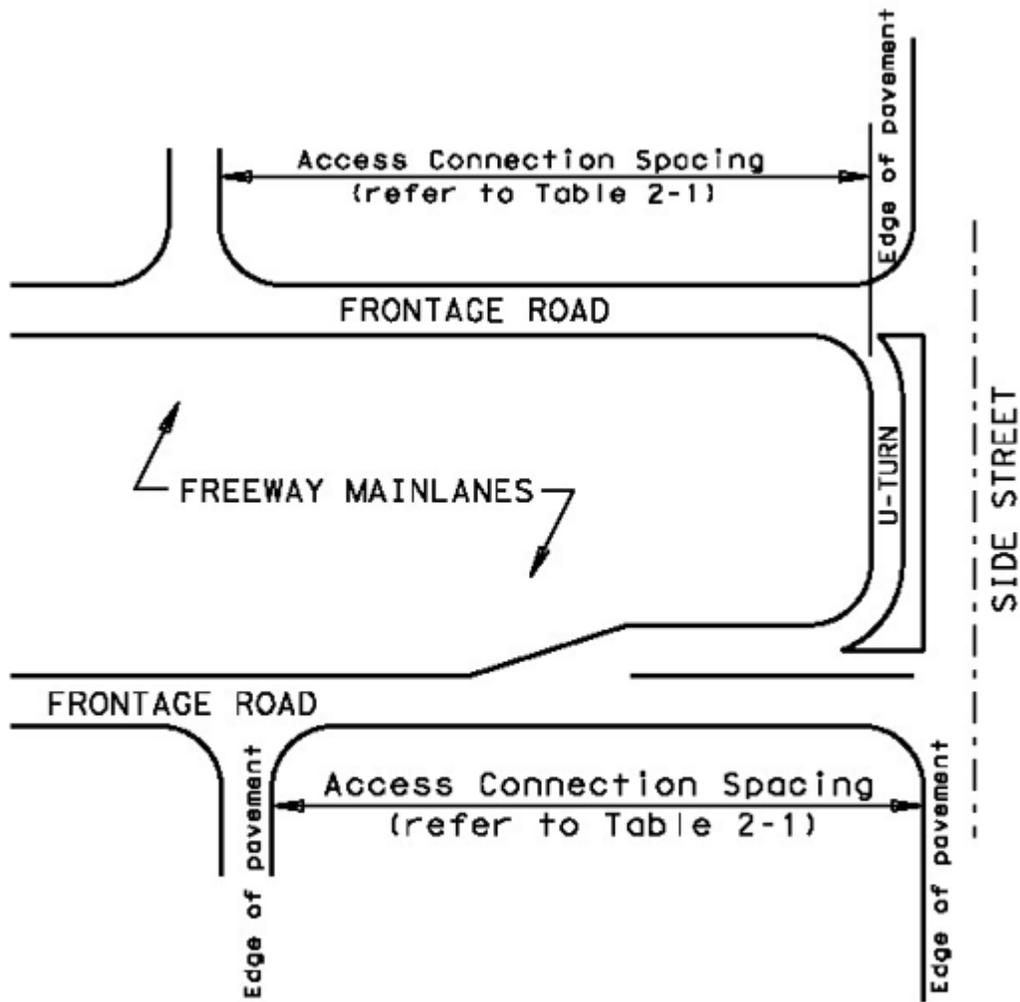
Frontage Road U-Turn Spacing Diagram
